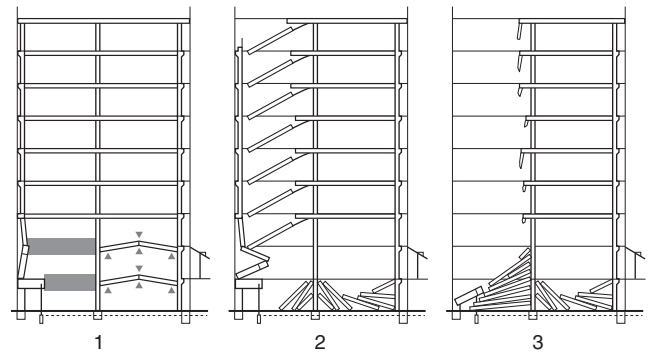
(i) Lift and Drop Collapse Pattern — Concrete Heavy Floor Construction.
